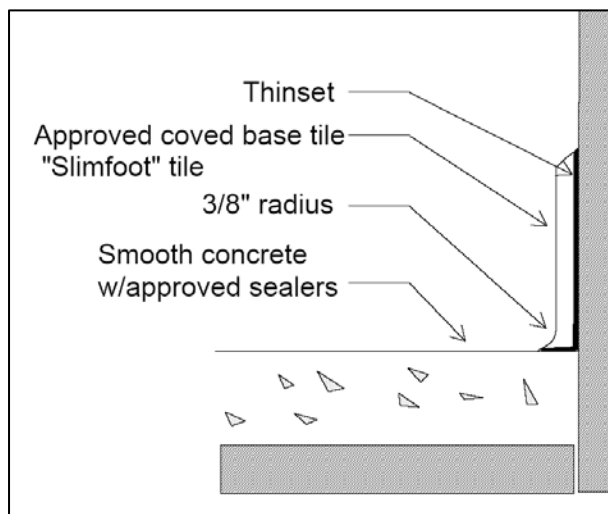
Sealed concrete floor and “slimfoot” ceramic cove base
